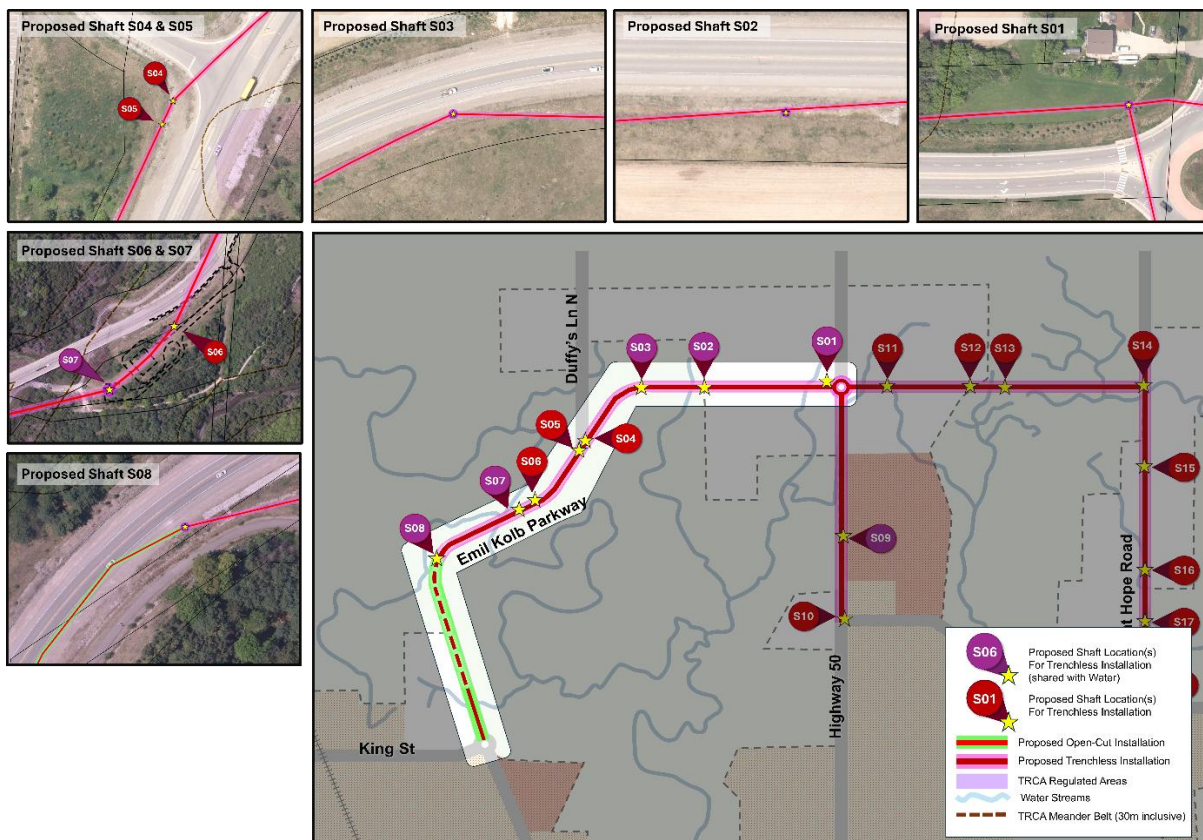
Preferred Wastewater Design along Emil Kolb Parkway
